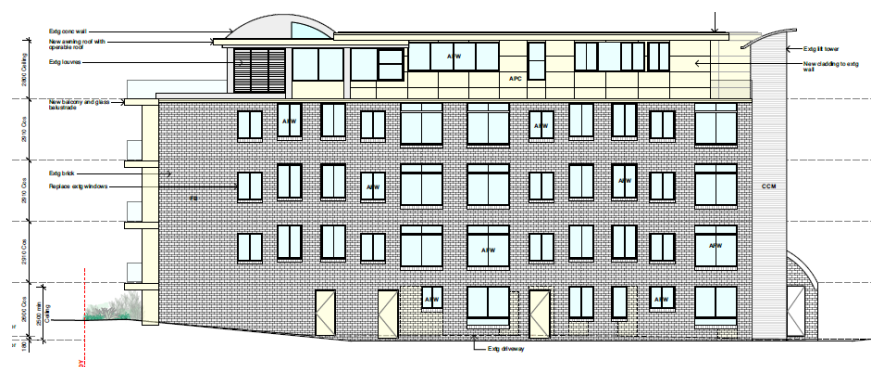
Revised northern elevation in PL/39/2021 – 10 Major Street, Coogee (Source: Ken Powell Architect)
